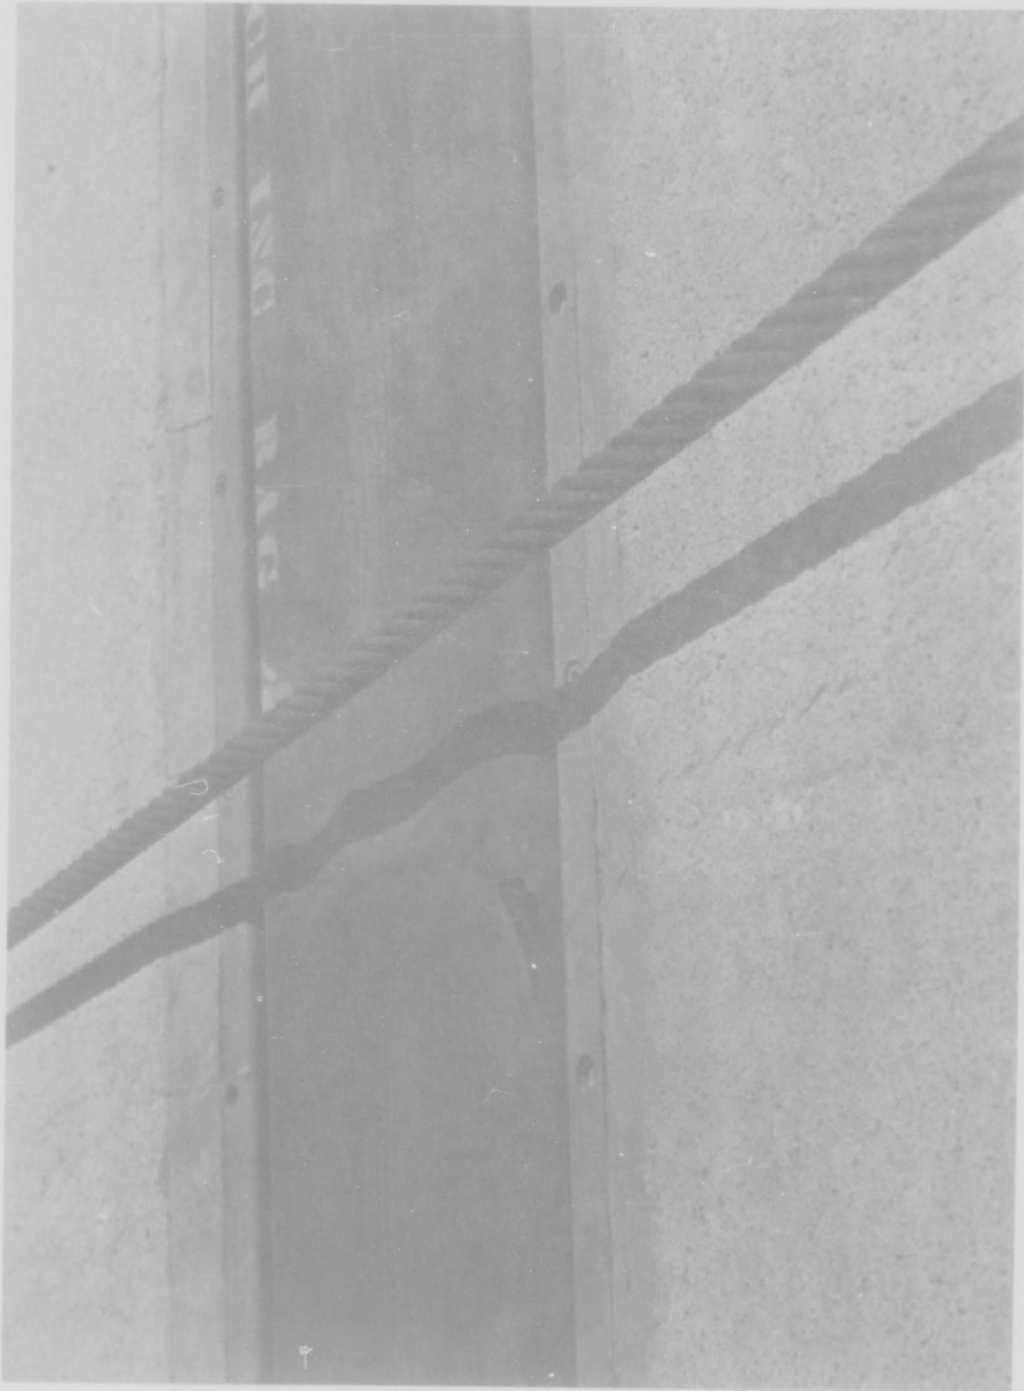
PINCH HOLE CAUSED BY CABLE IMPACT
